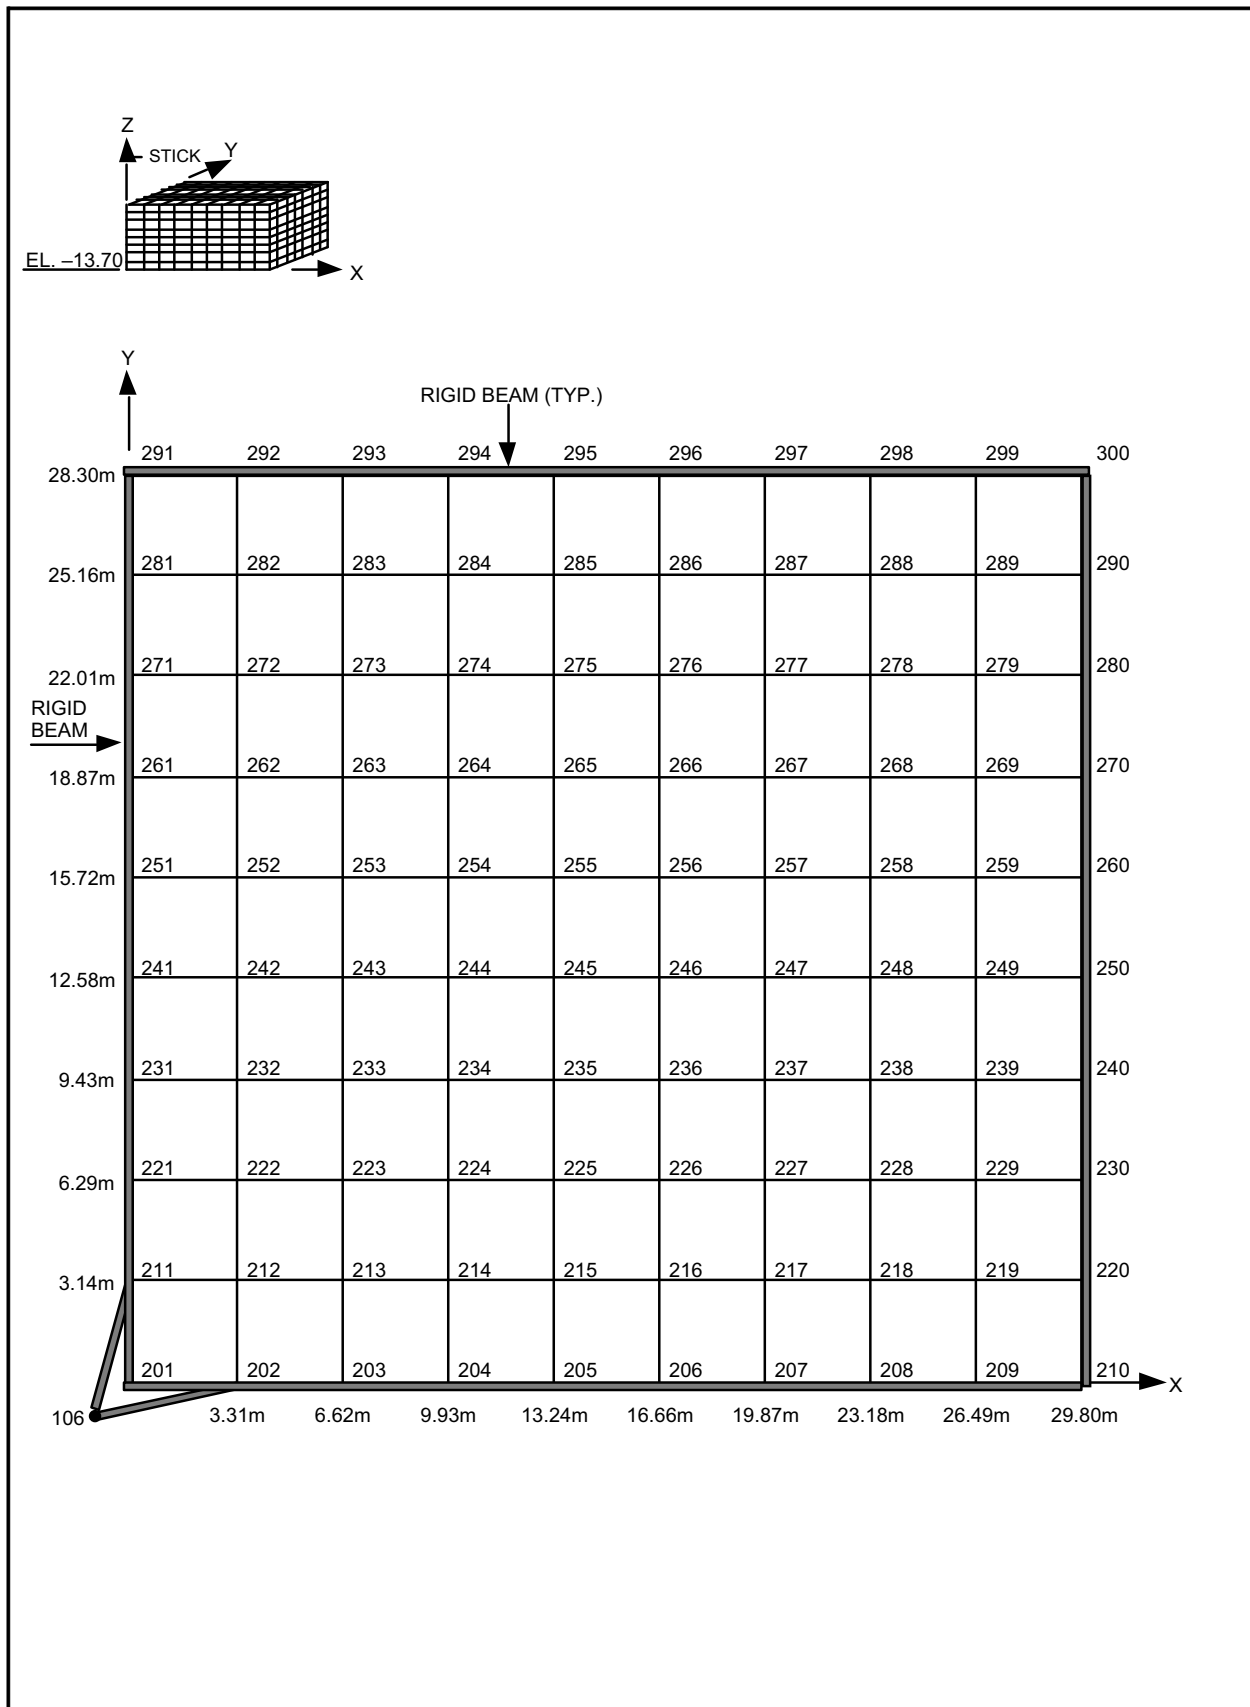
A-16 UB Case: Nodal Points at Elevation -13.70m
